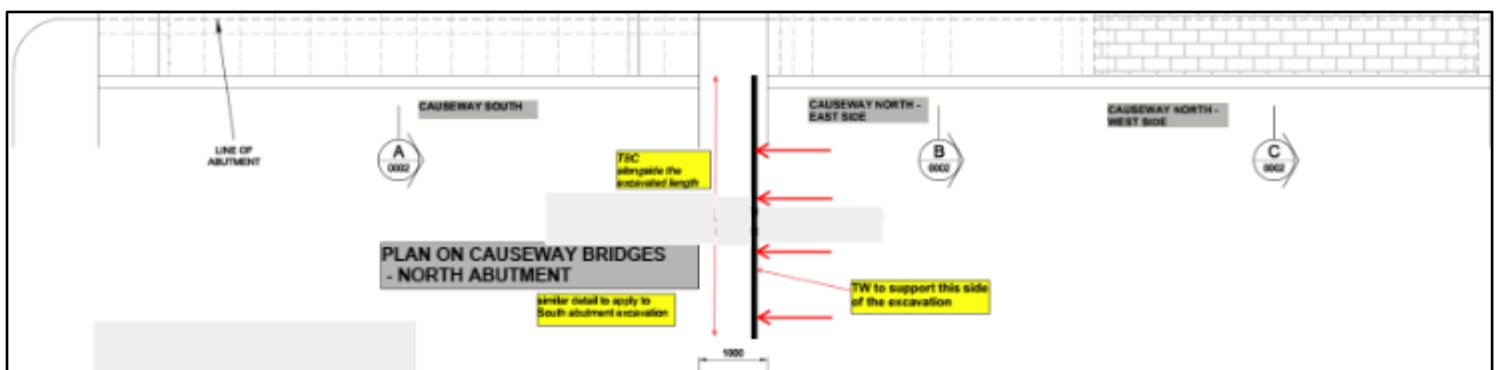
Line of temporary supports to side of excavation on North Abutment
